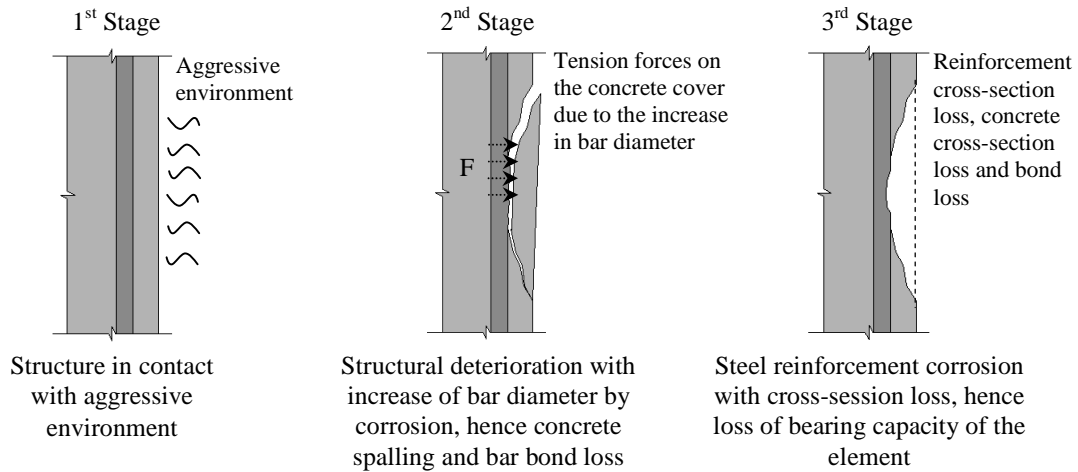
General representation of corrosion effects in reinforced concrete structures
